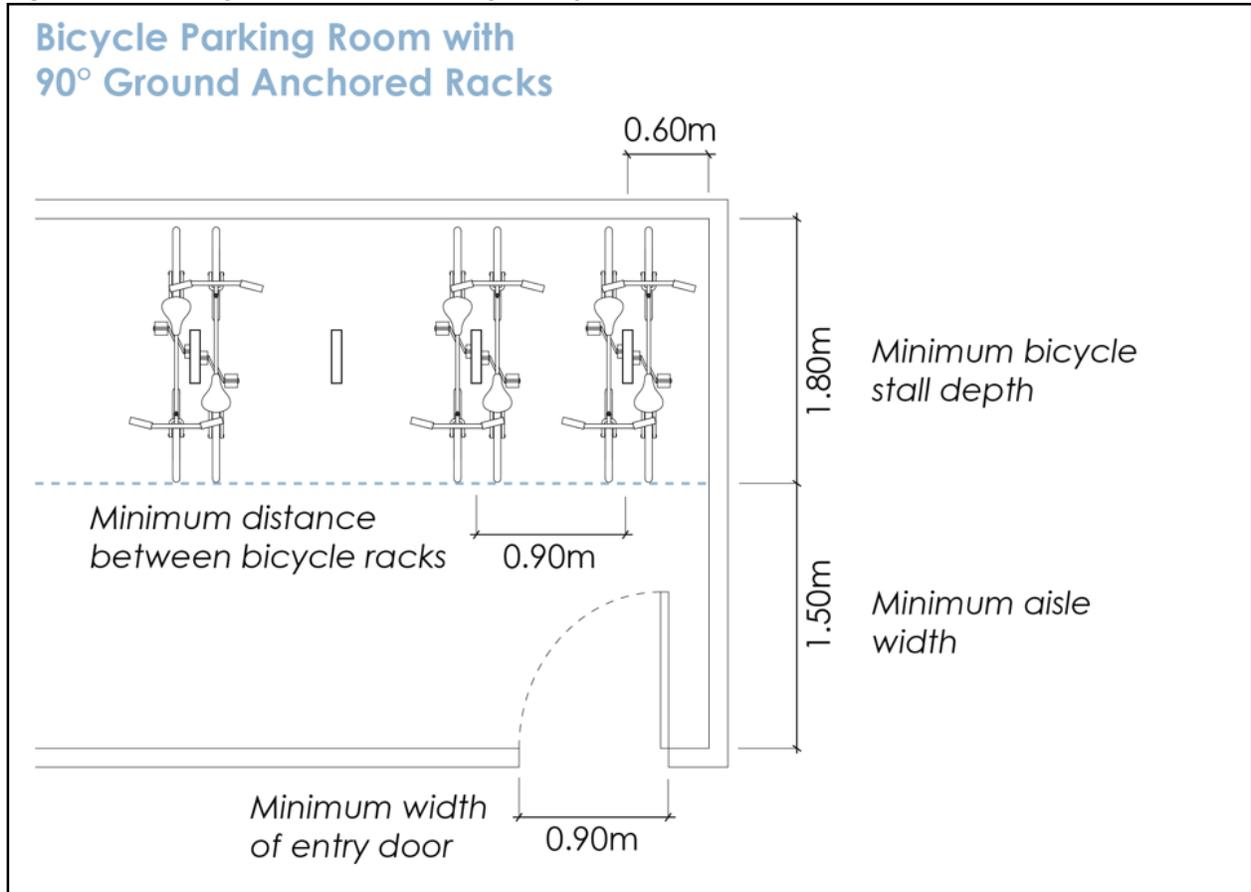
Short-Term Bicycle Parking Configuration Example
